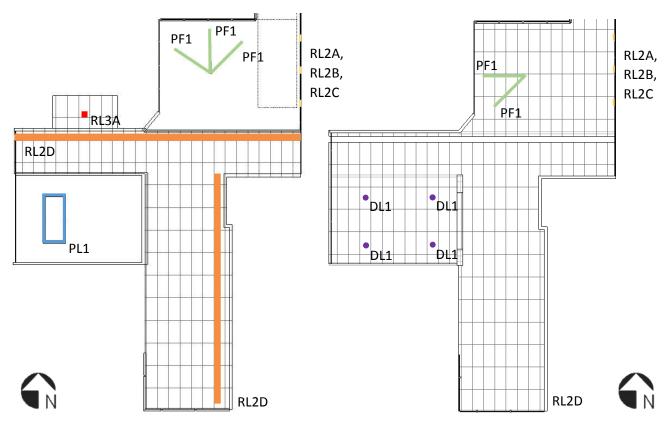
| Reflected Ceiling Plan Lobby Level 1
